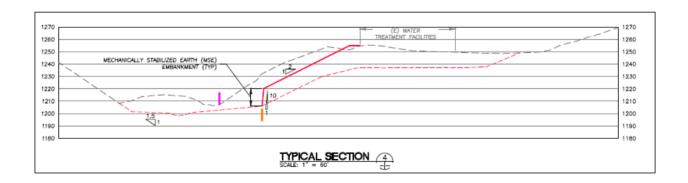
Typical Section of Potential MSE Wall to protect Water Treatment Facilities
